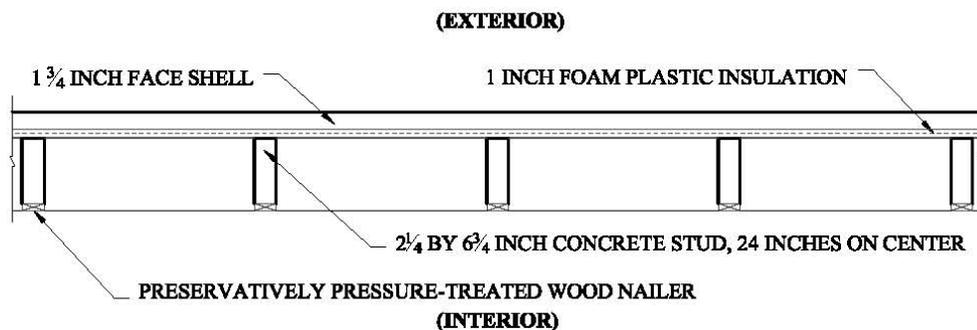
TYPICAL SUPERIOR WALL HORIZONTAL SECTION DETAIL
